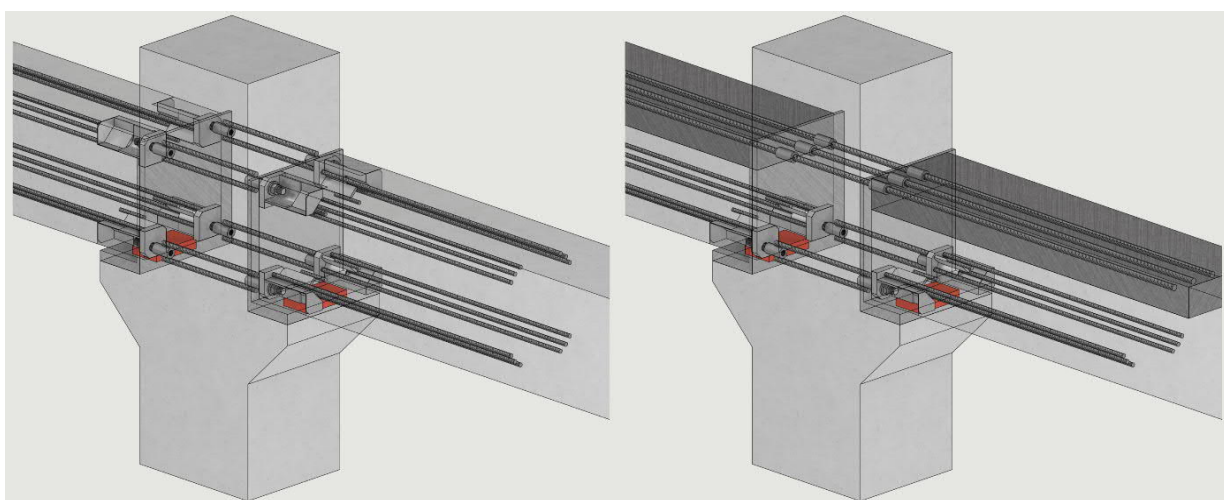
Rigid shoe connection and shoe-to-rebar coupler connection
